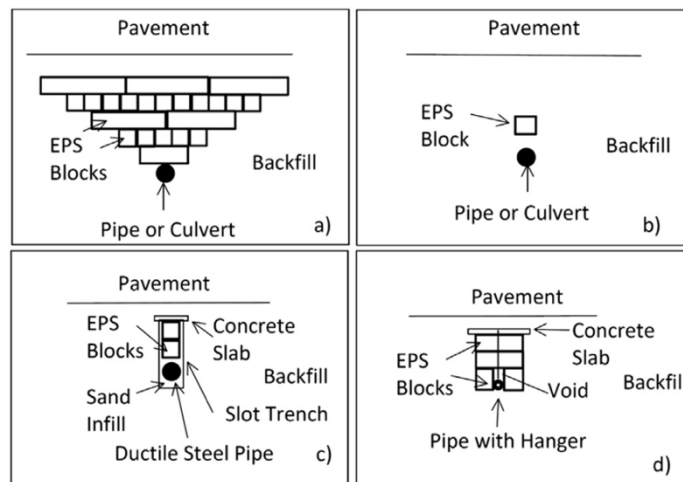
General methods of protecting pipelines and culverts from vertical ground displacement: (a) lightweight cover or embankment constructed over pipe or culvert; (b) “imperfect trench method” with compressible inclusion EPS block placed above pipe or culvert; (c) slot-trench lightweight cover system with EPS block placed in slot; and (d) EPS post and beam system with head space void.
